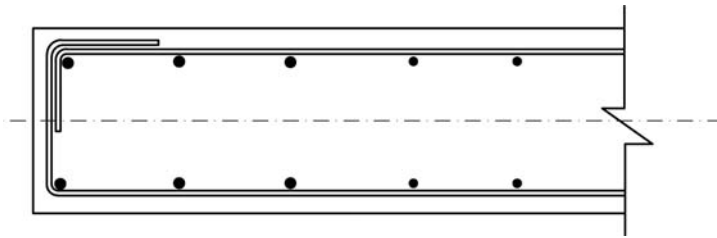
Typical unconfined shear wall boundary zone detail permitted in NCh430.
